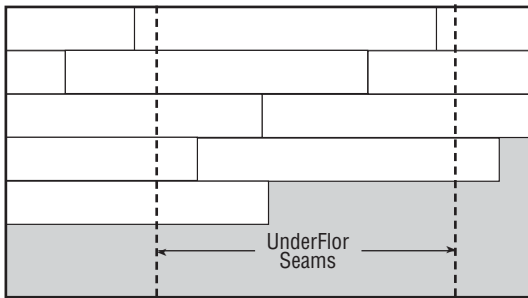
Install Underflor perpendicular to the long dimension of the plank flooring
